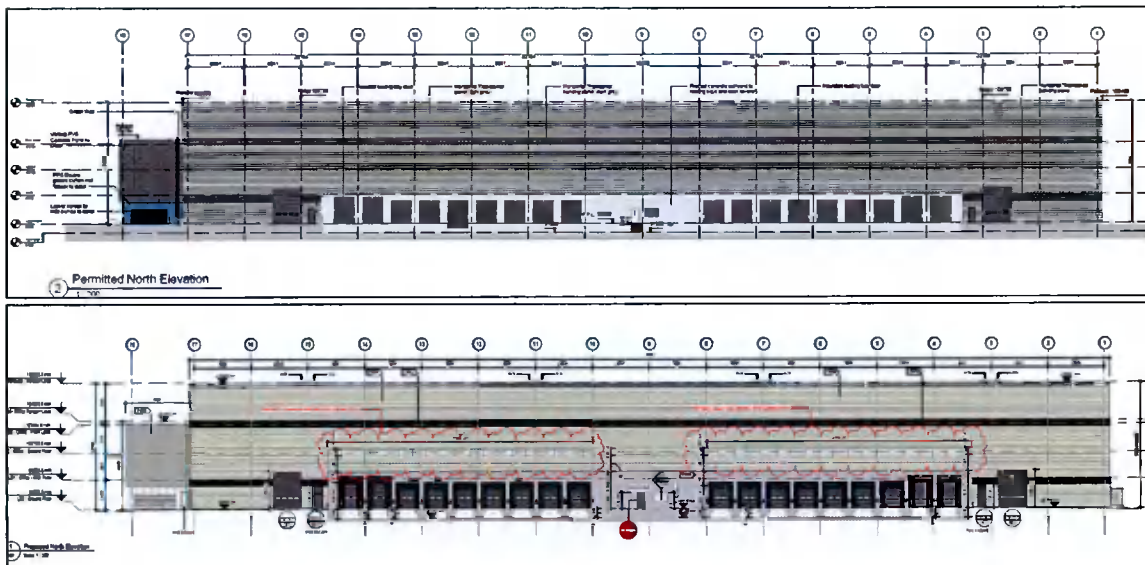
Extract from the Permitted and Proposed Northern Elevations Demonstrating the Extent of the Additional Windows Proposed Above the Dock Levellers
